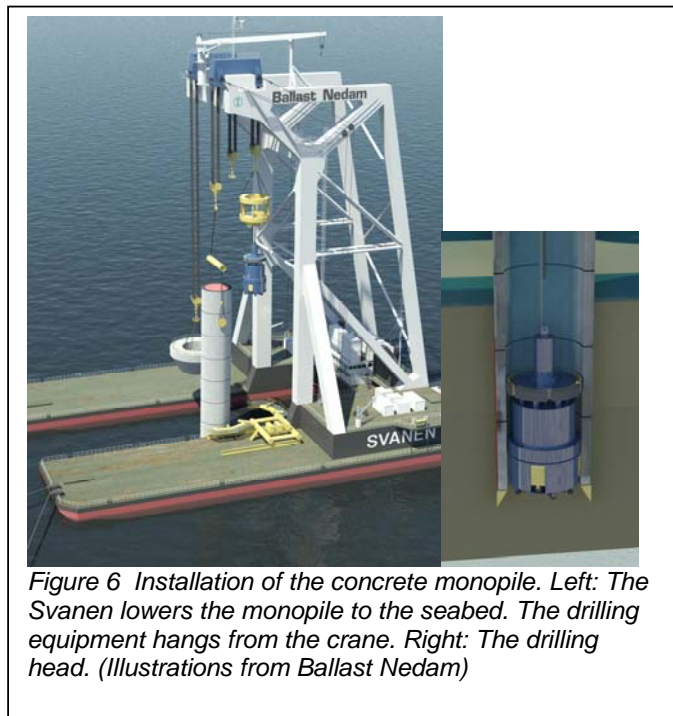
Installation of the concrete monopile. Left: The Svanen lowers the monopile to the seabed. The drilling equipment hangs from the crane. Right: The drilling head. (Illustrations from Ballast Nedam)
